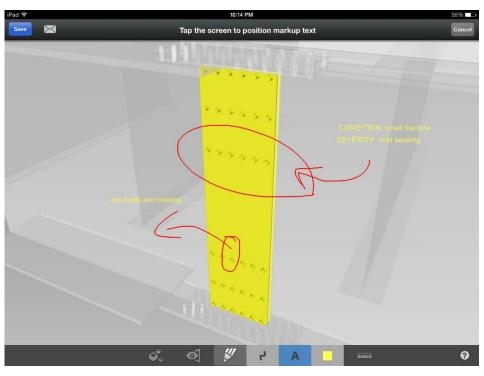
Drawing sketches and entering notes in BIM 360 Glue
